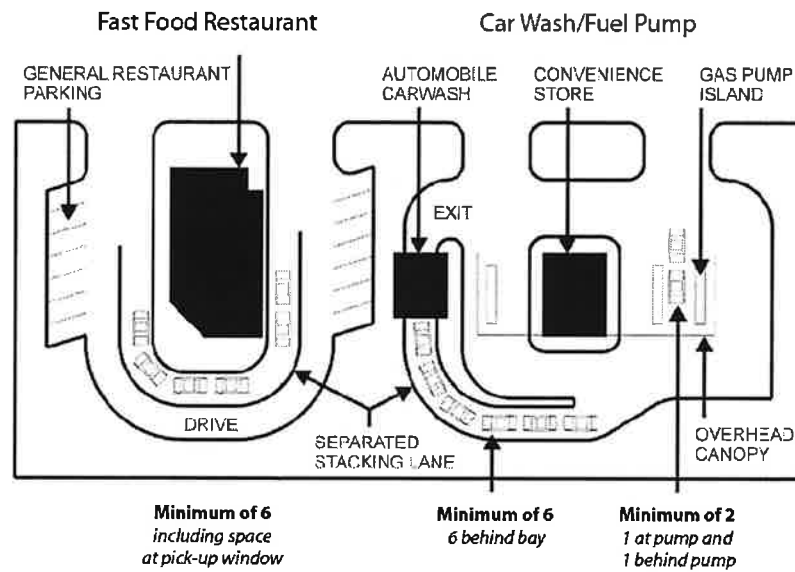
Location of Stacking Spaces and Lanes. Note that the stacking lanes are oriented toward the side and rear yards rather than the front yard.
